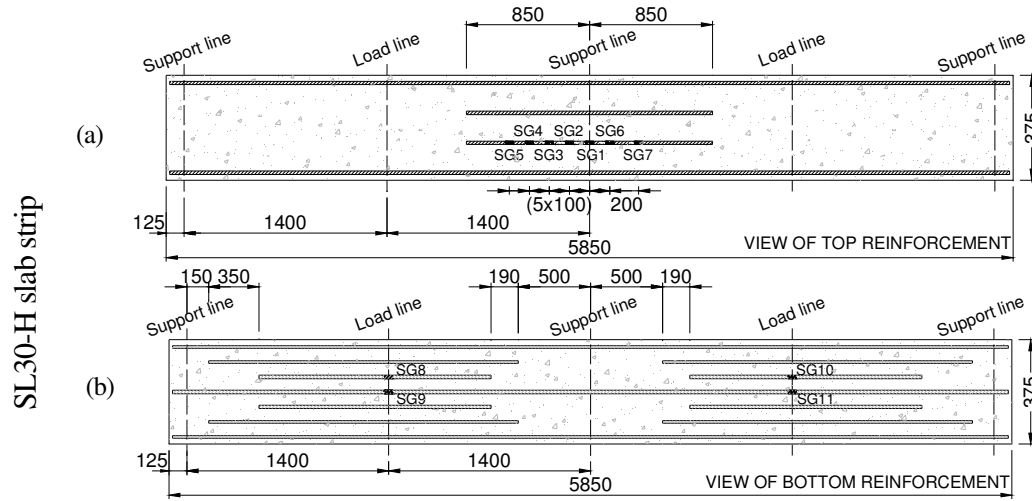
Arrangement of the (a-b) longitudinal steel of the SL30-H slab strip.
